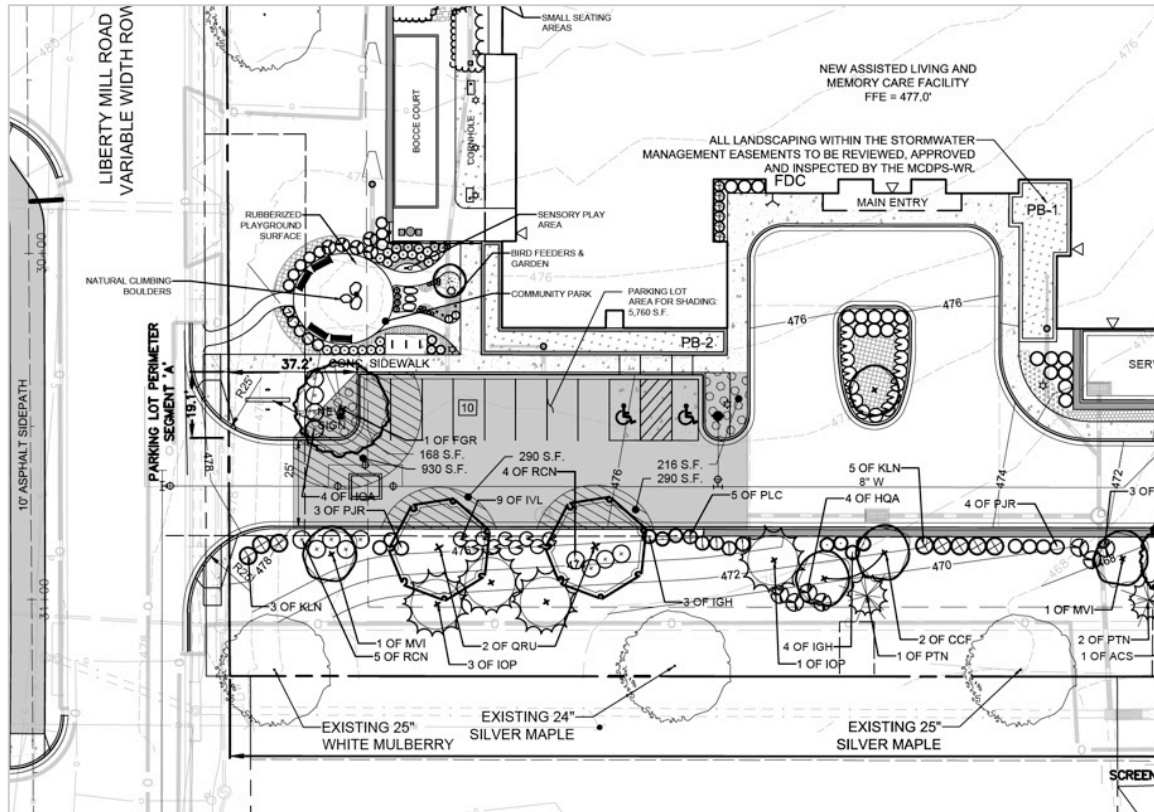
Landscape plan for the surface parking lot (shaded) near the main entrance of the building.
